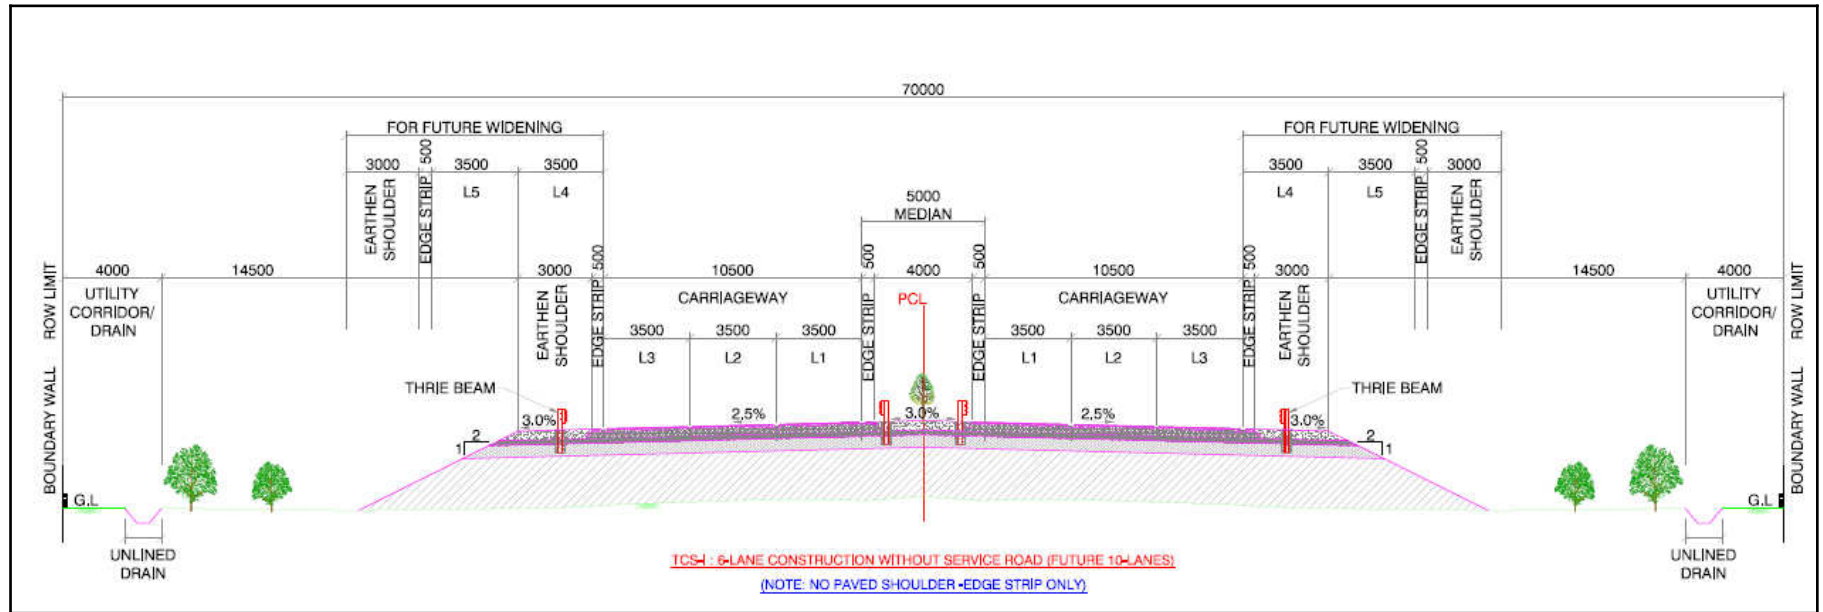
LANE CONSTRUCTION WITHOUT SERVICE ROAD (FUTURE 10 LANES)
